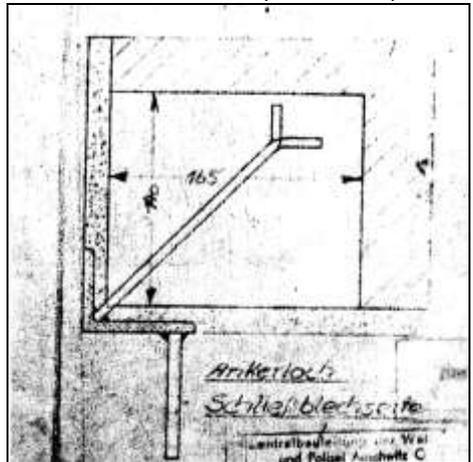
Blueprint of the wall anchor for a frame of a sturdy, gas-tight steel door.
